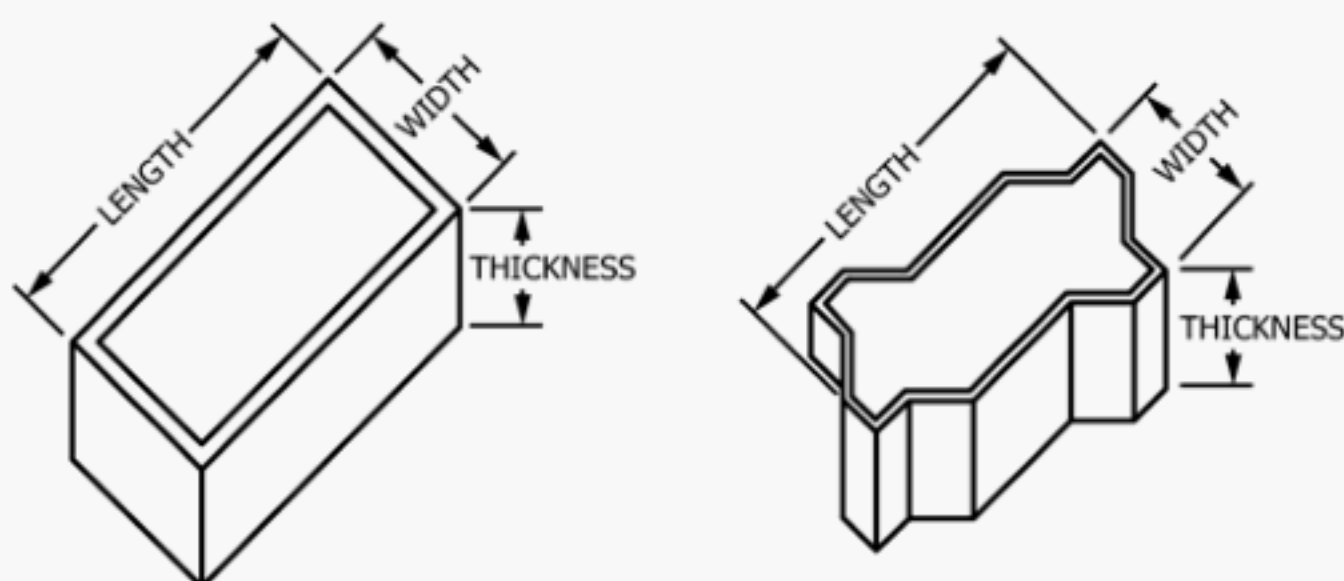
Length, Width, and Thickness of Concrete Paving Units
